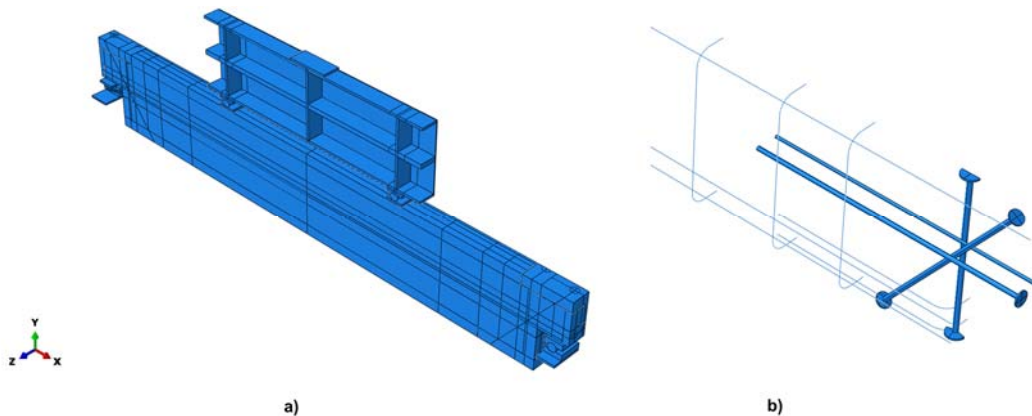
a) Typical model setup; and b) Typical reinforcing cage (detail at one end shown)
